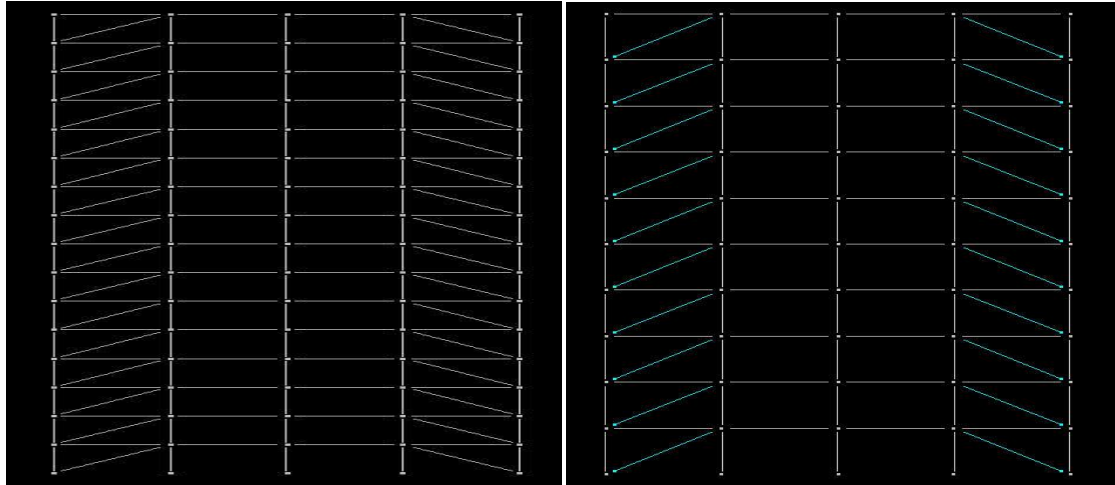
The Places of Viscous Dampers in (a) a 10-story Building and (b) a 16-story Building
